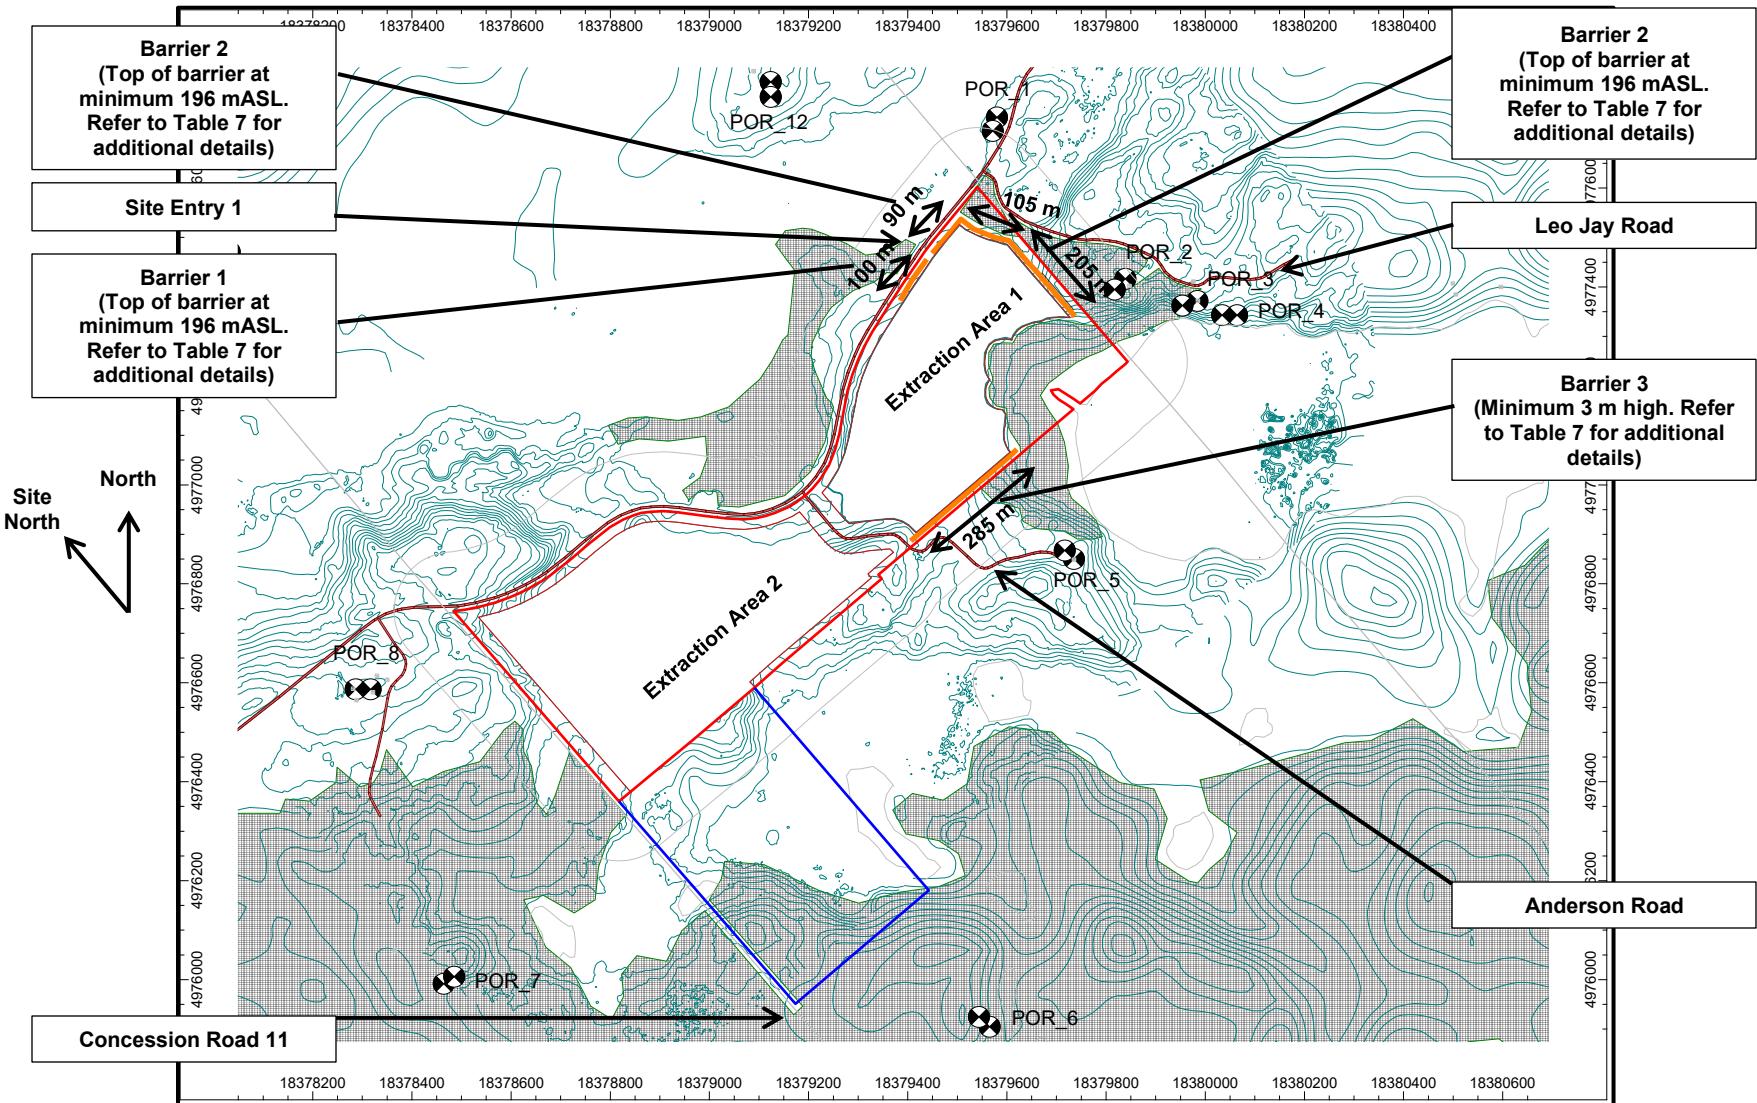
Detail plan at Mobile Screening Plant showing location of noise barriers (stockpiles) when operating in Extraction Area 1
